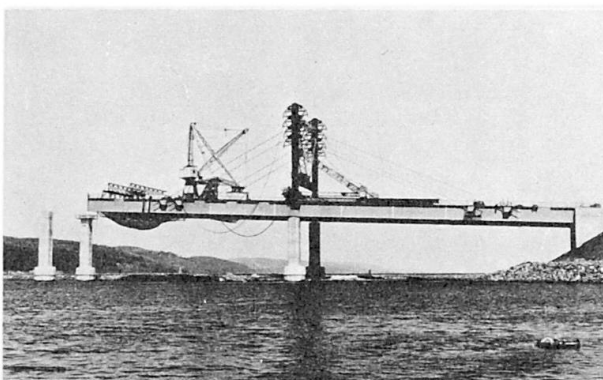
Cantilevered erection of approach spans showing temporary towers and cables, and other erection equipment
